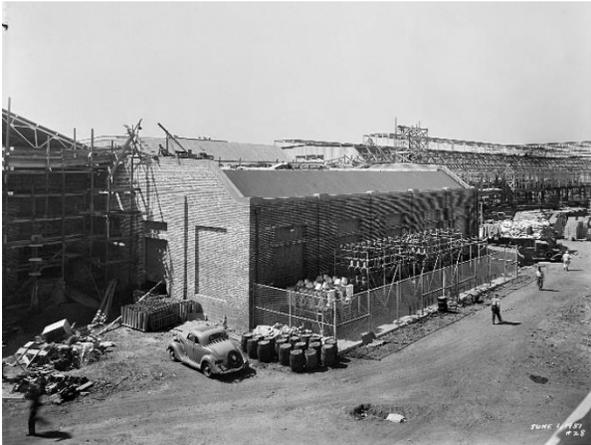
Completed Building 6 (at center), Buildings 8 and 12 under construction, June 1937. Photo in collection of Oakland History Center, Oakland Public Library.
